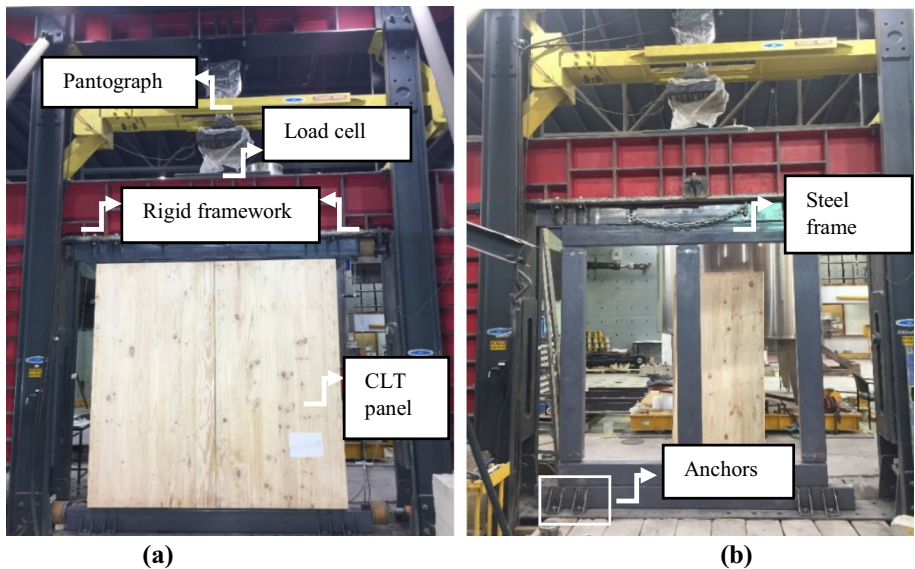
Details from FPSW configuration: a CLT panel assembly; b hollow steel frame assembly
